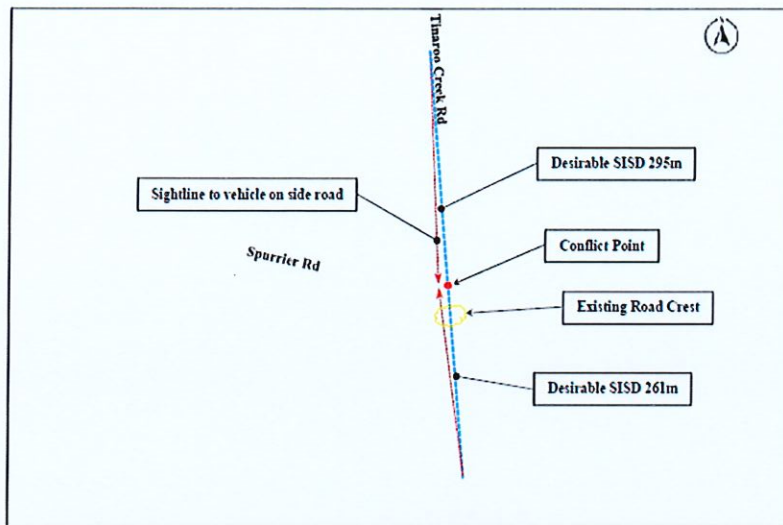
Tinaroo Creek Road/Spurrier Road Intersection - SISD Assessment
